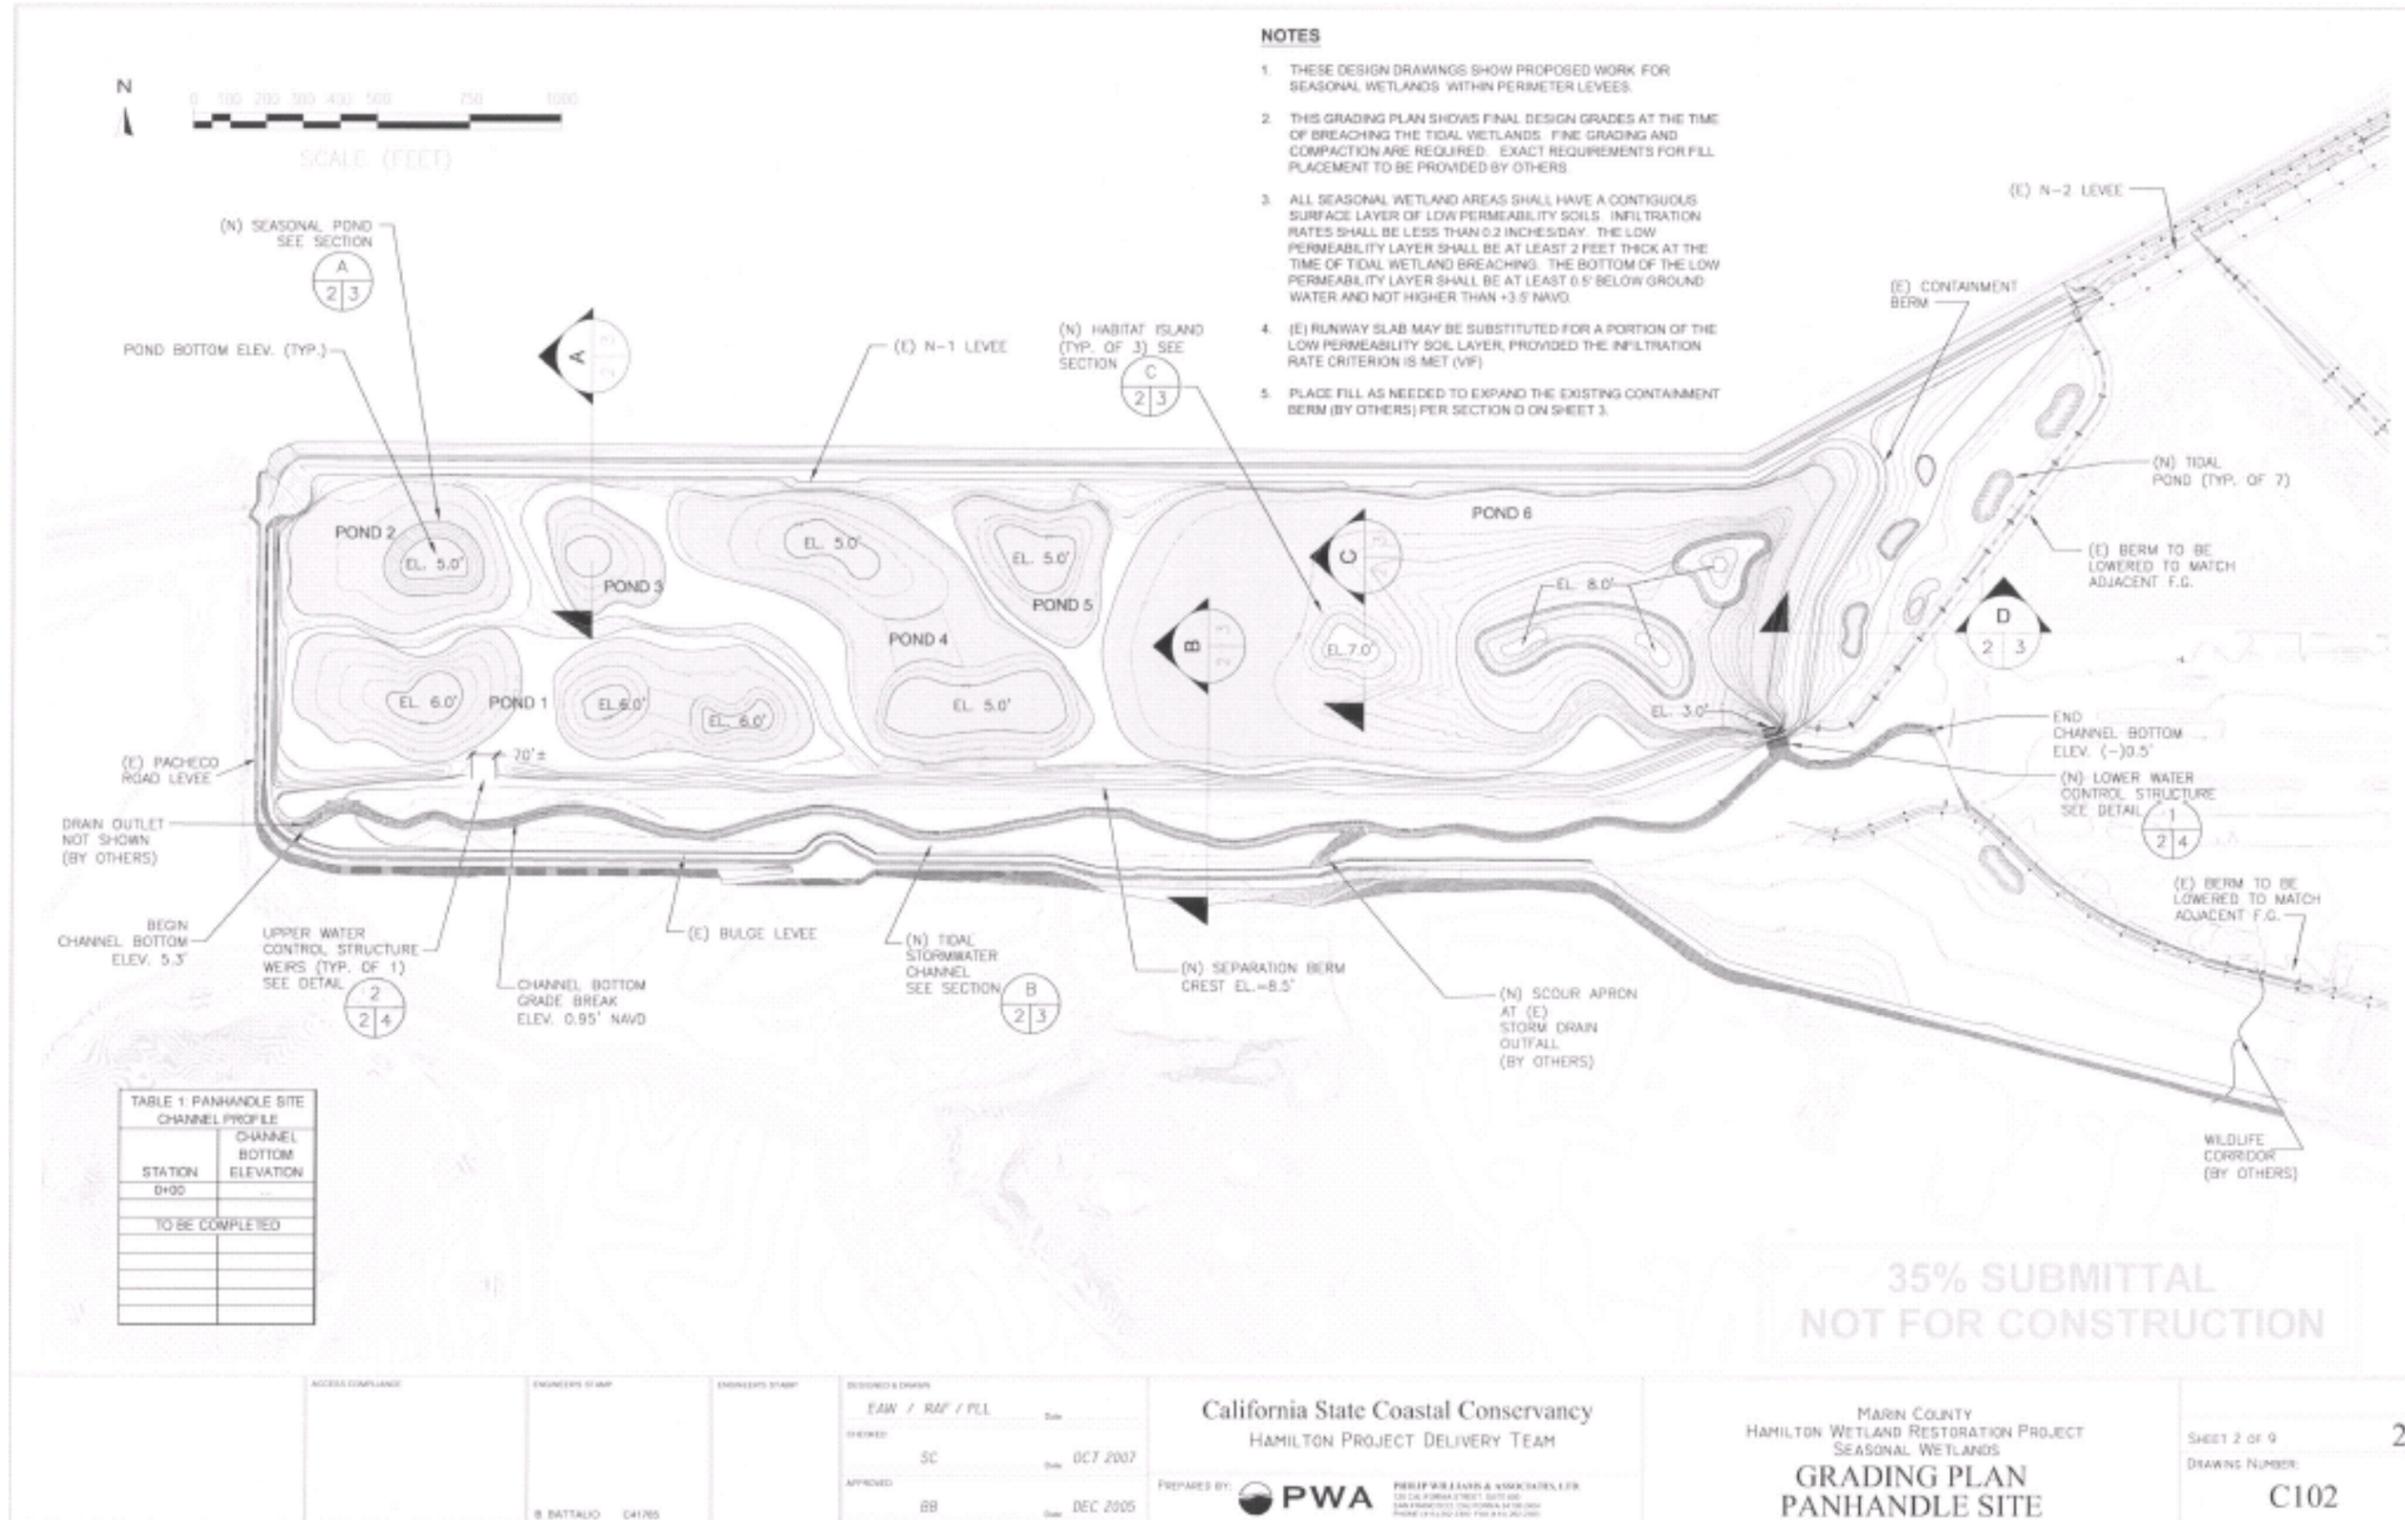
Grading Plan – Panhandle Site (N. Seasonal Wetland)
